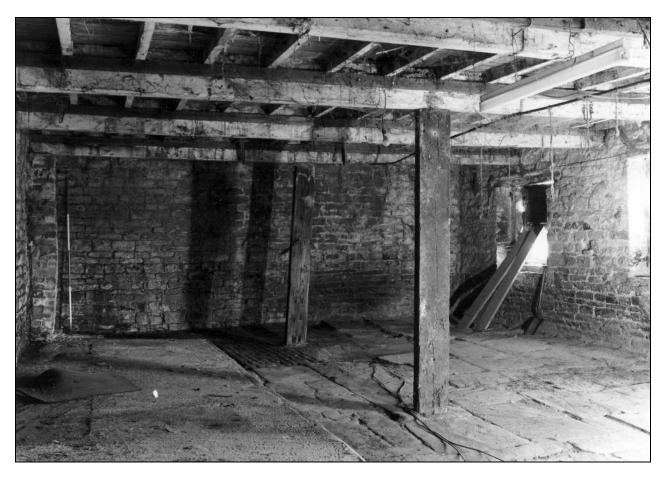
Building 1a: ground floor, from the south-west (film 3, frame 9)
